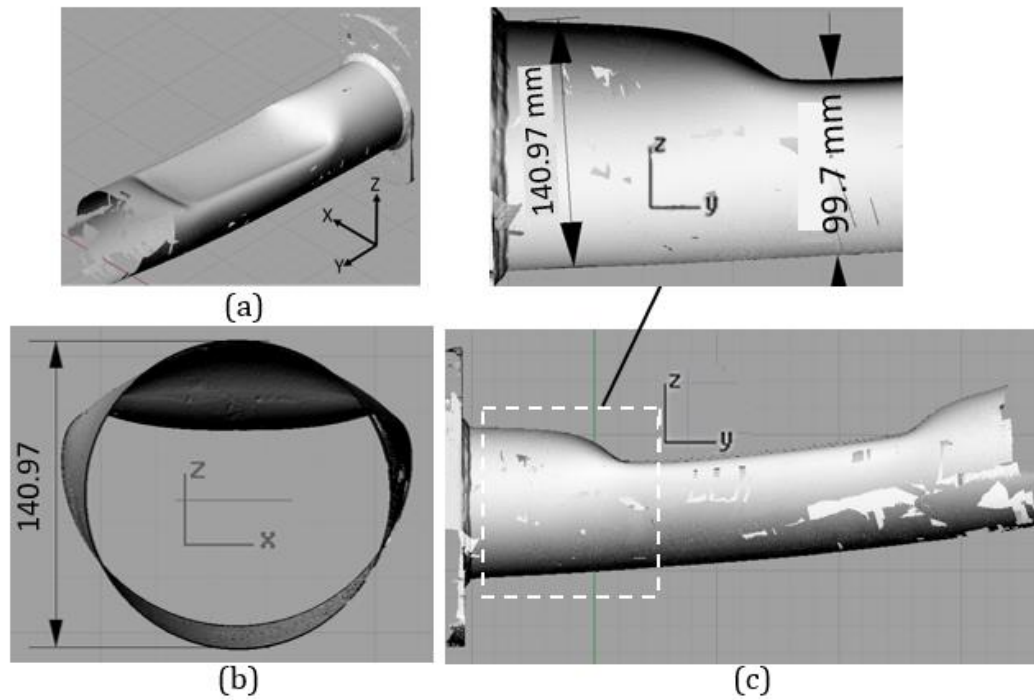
Scanned Views of a Section-Cut of the Deformed Specimen in Test 4
